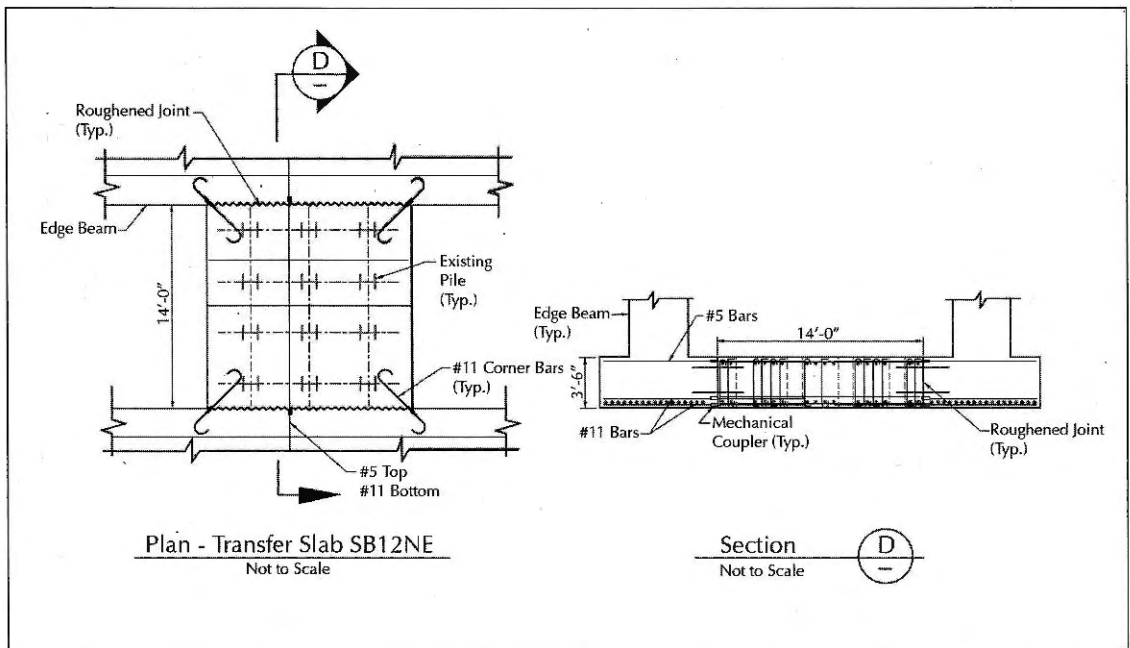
Typical underpinning transfer slab supporting the existing SR 0065 viaduct foundation.
